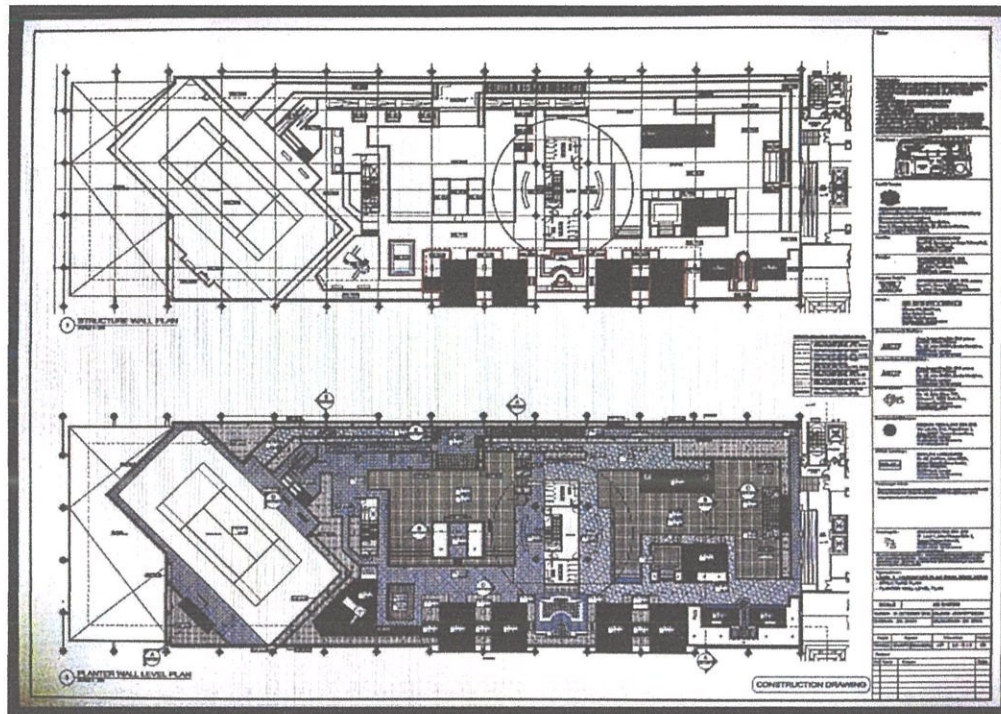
Layout 3rd floor plan (rooftop) of Car Park Buildings.
